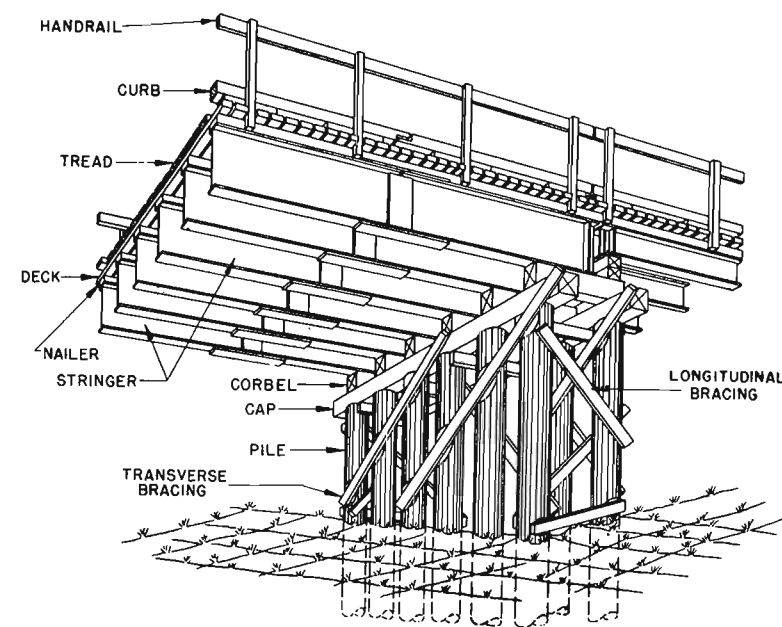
Highway bridge, class 50, double-lane, steel stringers on timber pile pier.
